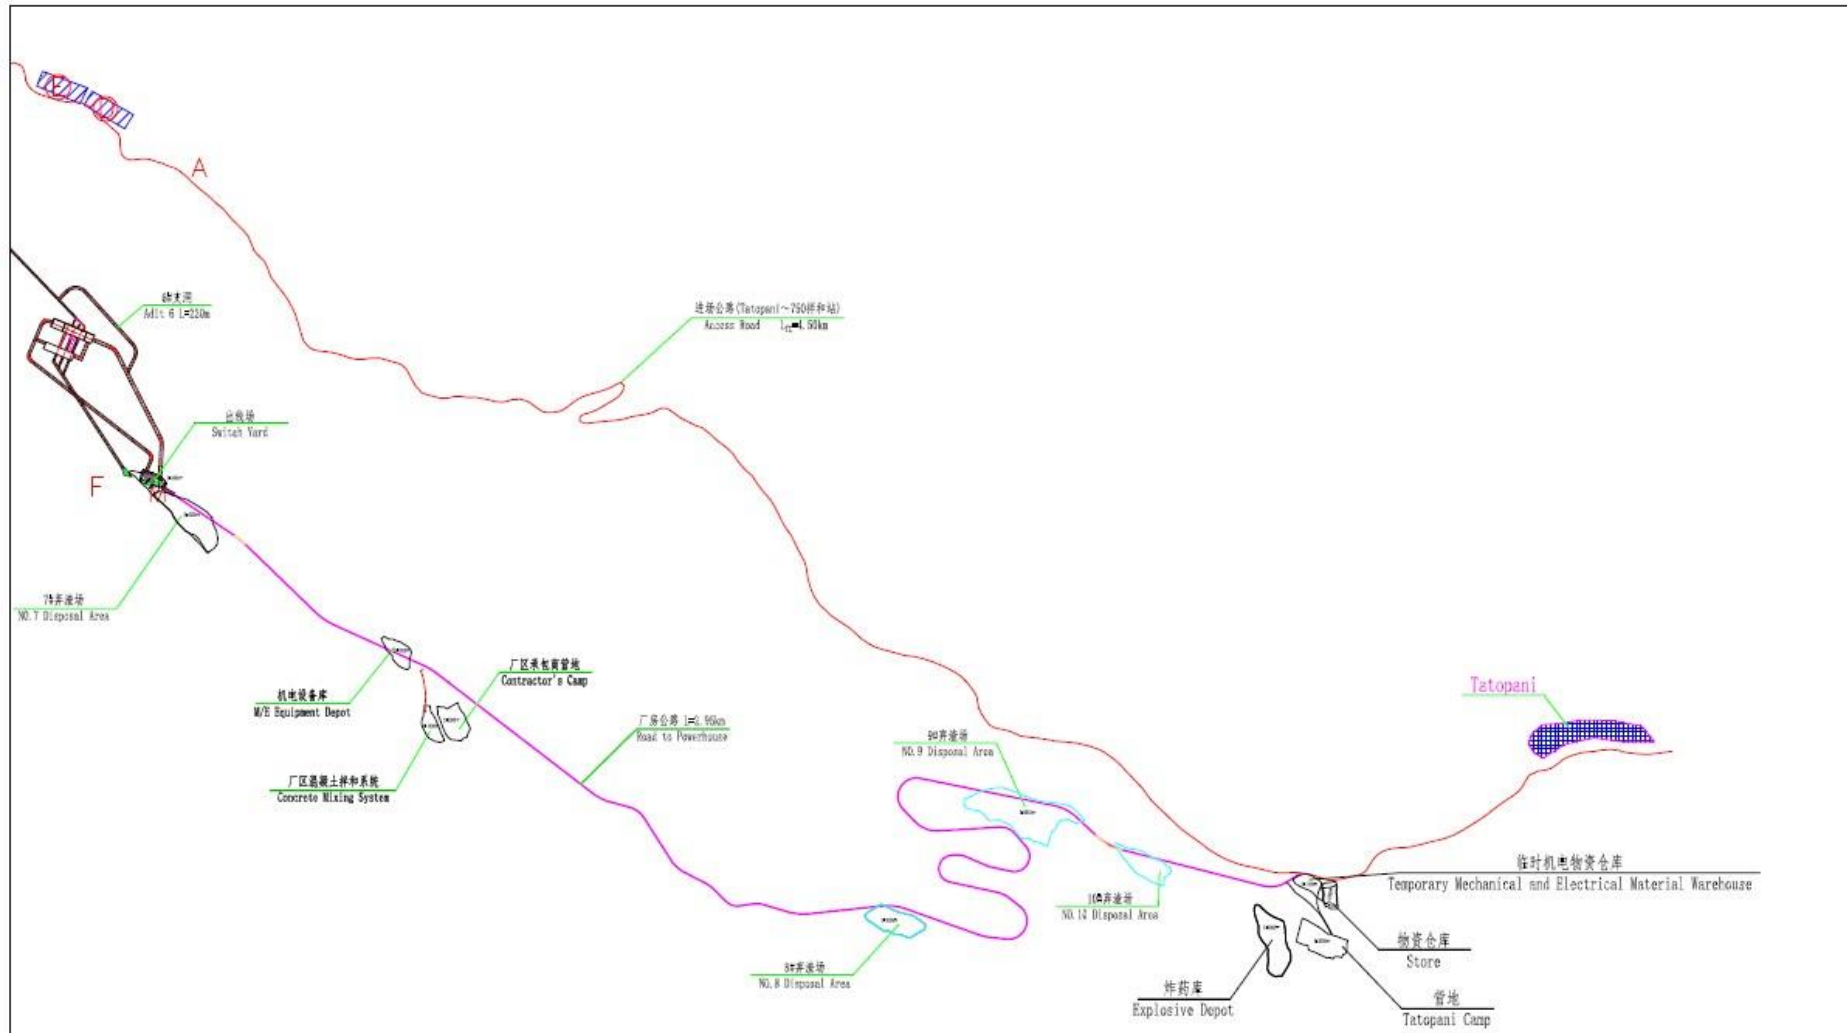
General Project Layout (Source: Detail Design Report 2021)
